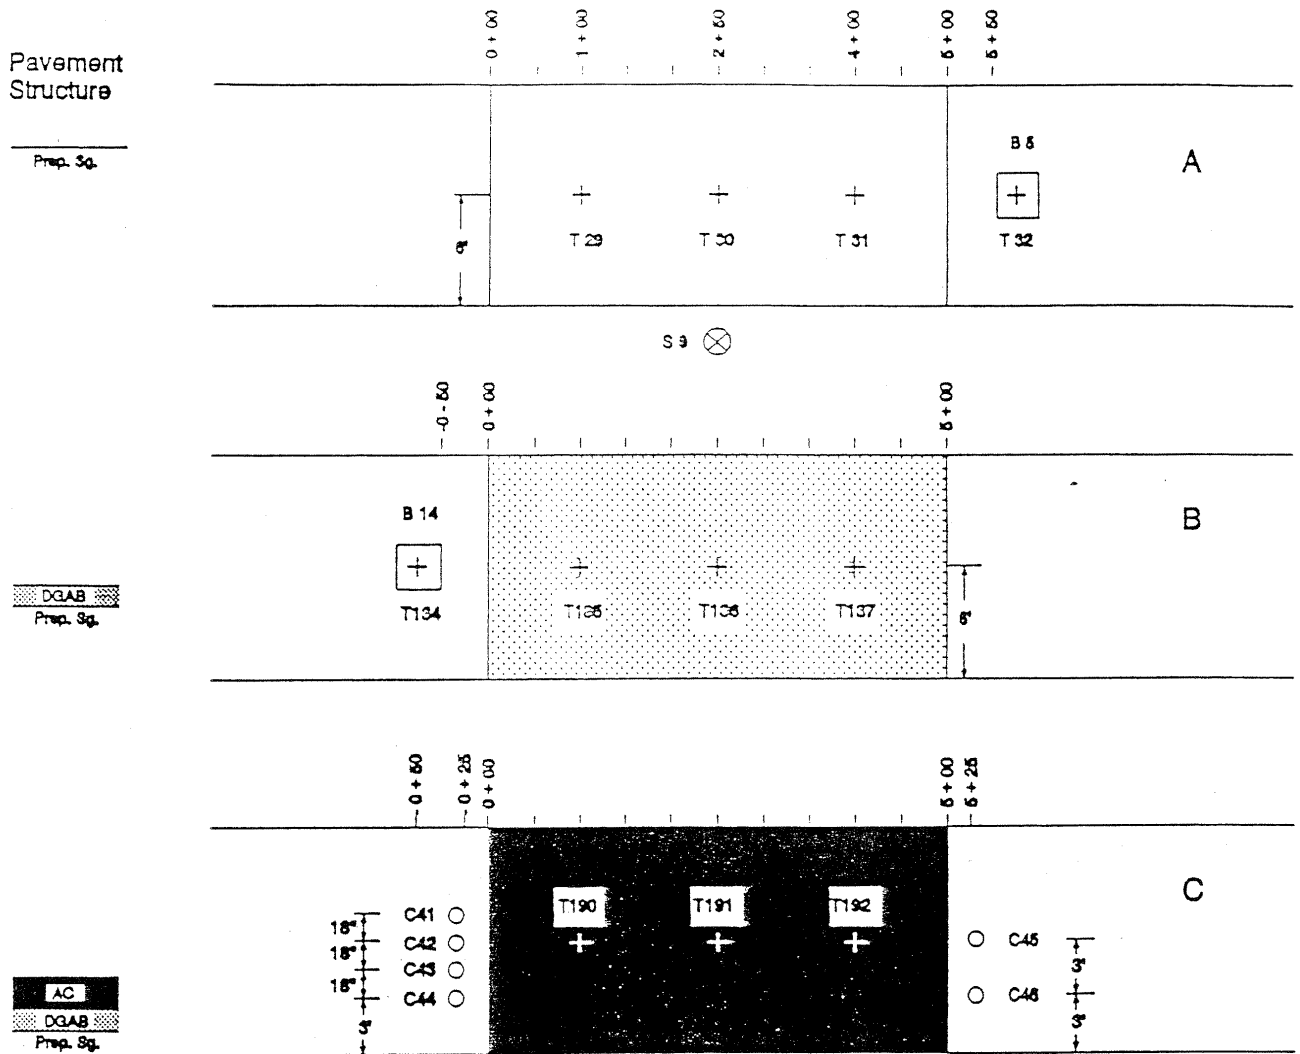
Sampling and Testing Plan for Test Sections 11 and 23
